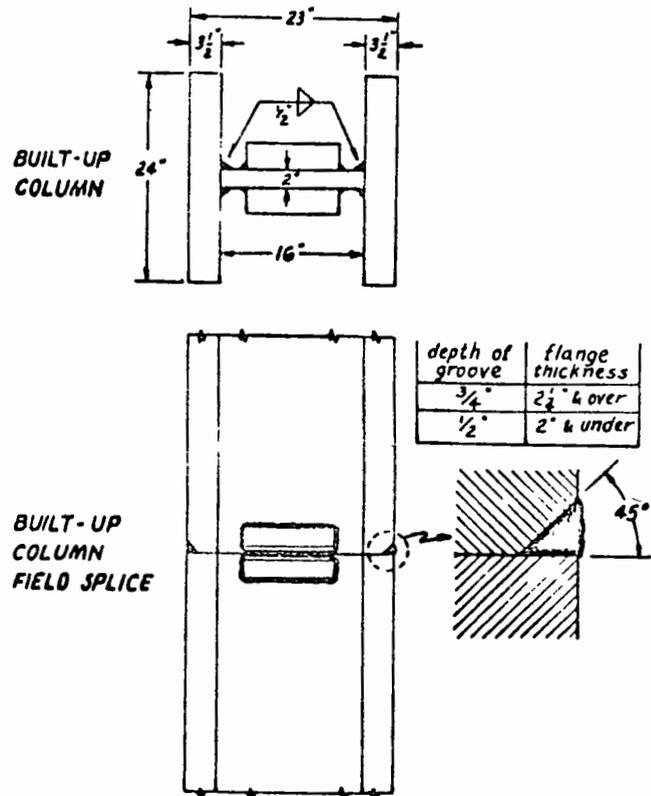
Typical column splice on Detroit Bank & Trust Building.
